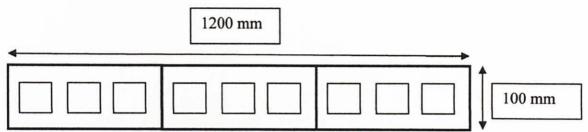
Plan view of the prototype crumb rubber noise barrier wall without crumb rubber filler and side wall
